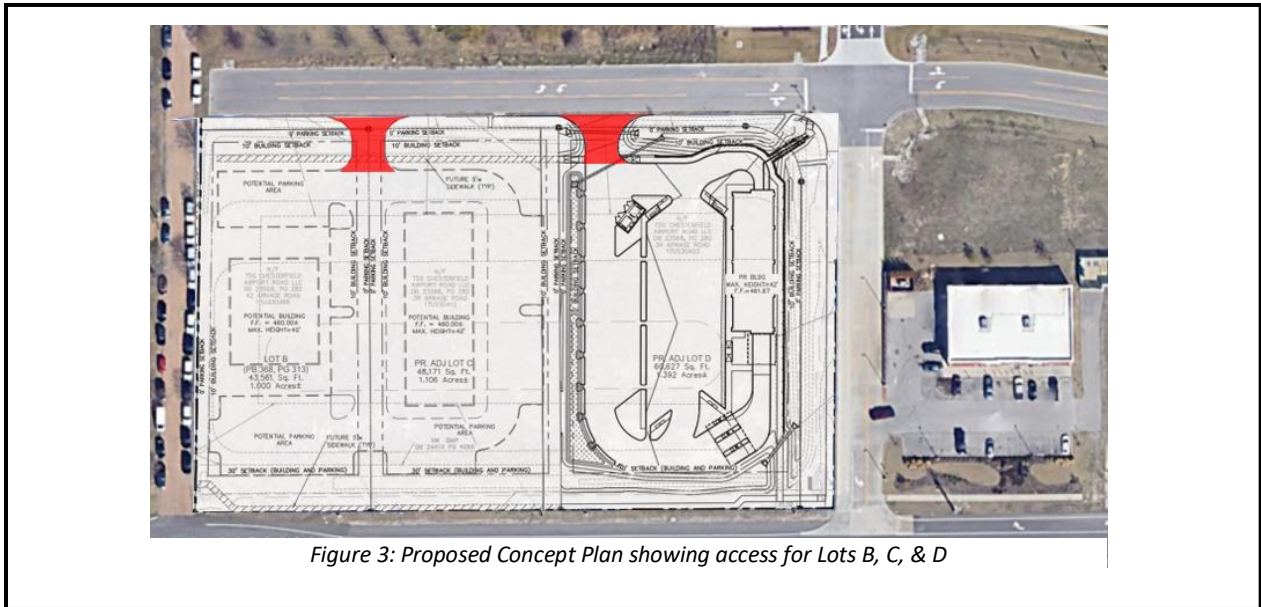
Proposed Concept Plan showing access for Lots B, C, & D
